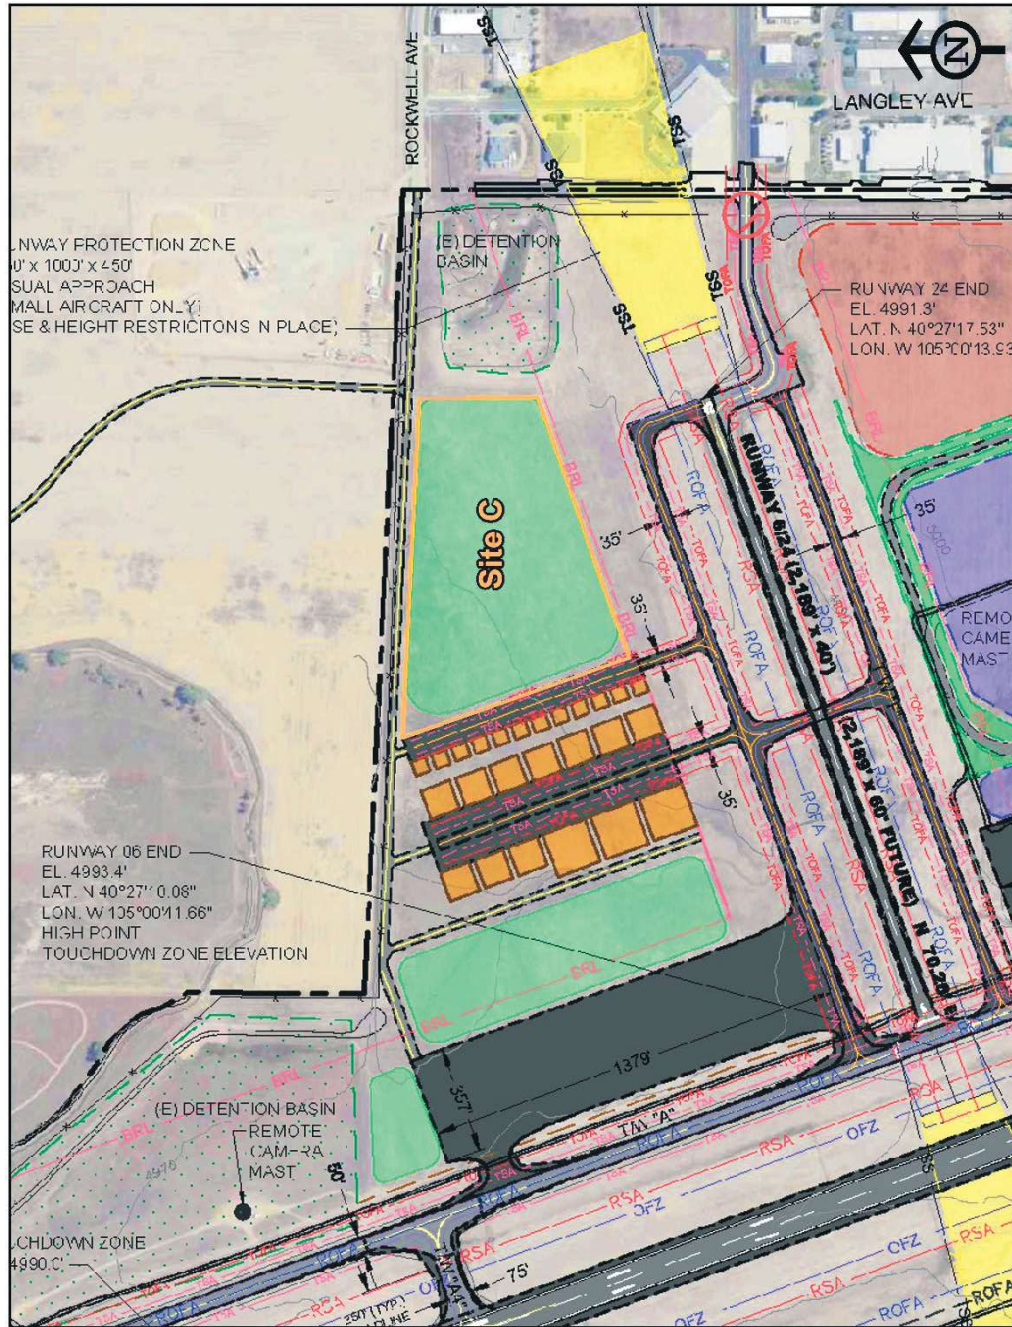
Site C Airport Layout Plan from 2020 Northern Colorado Regional Airport Master Plan
